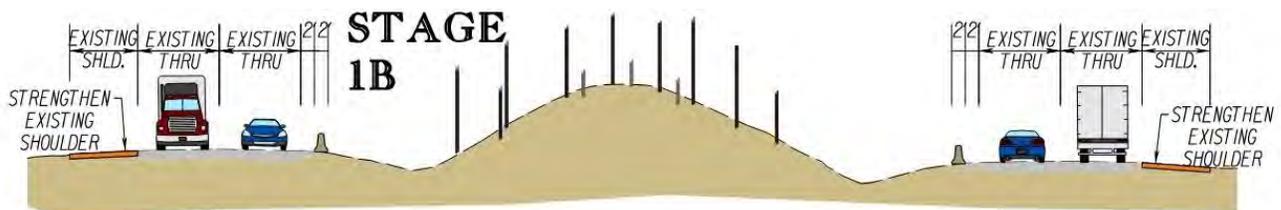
Stage 1B - Strengthen Outside Shoulders
